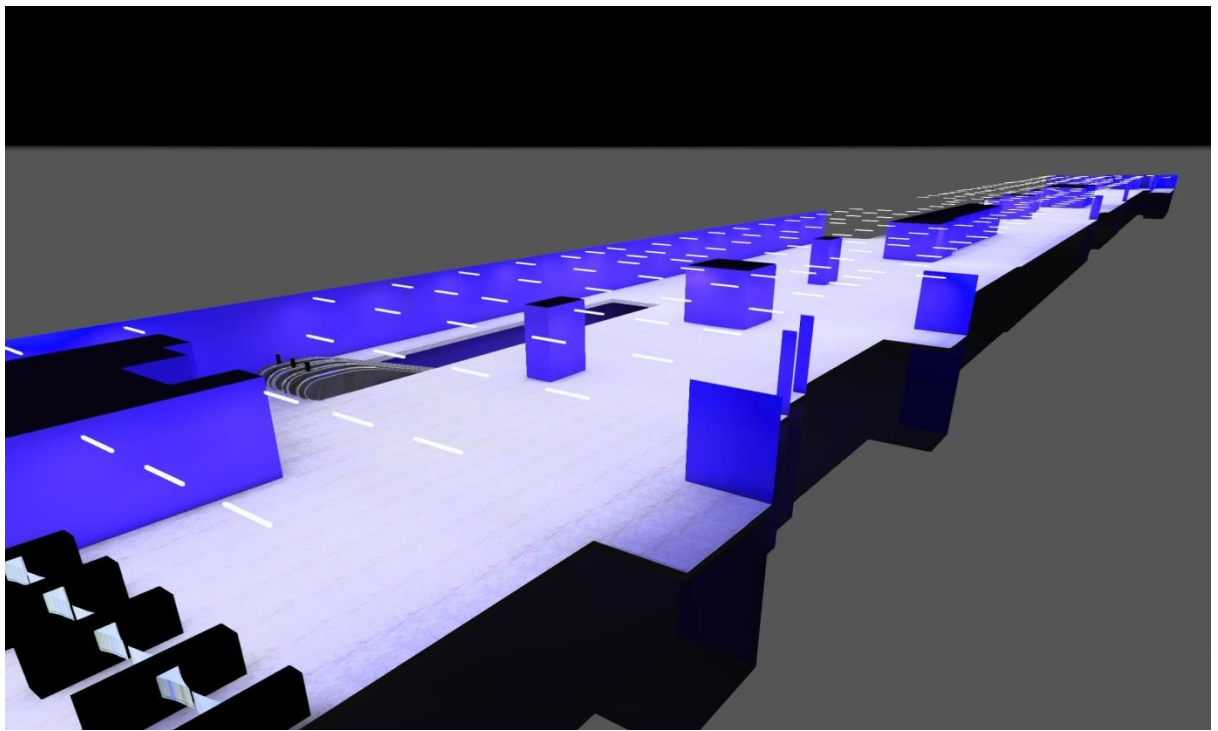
Typical Underground Metro Concourse(Paid) 3D Rendering
